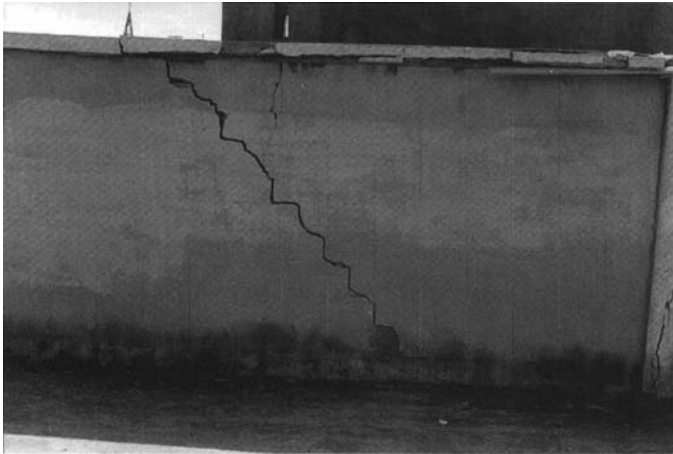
Cracking in a masonry wall due to expansive soil.
